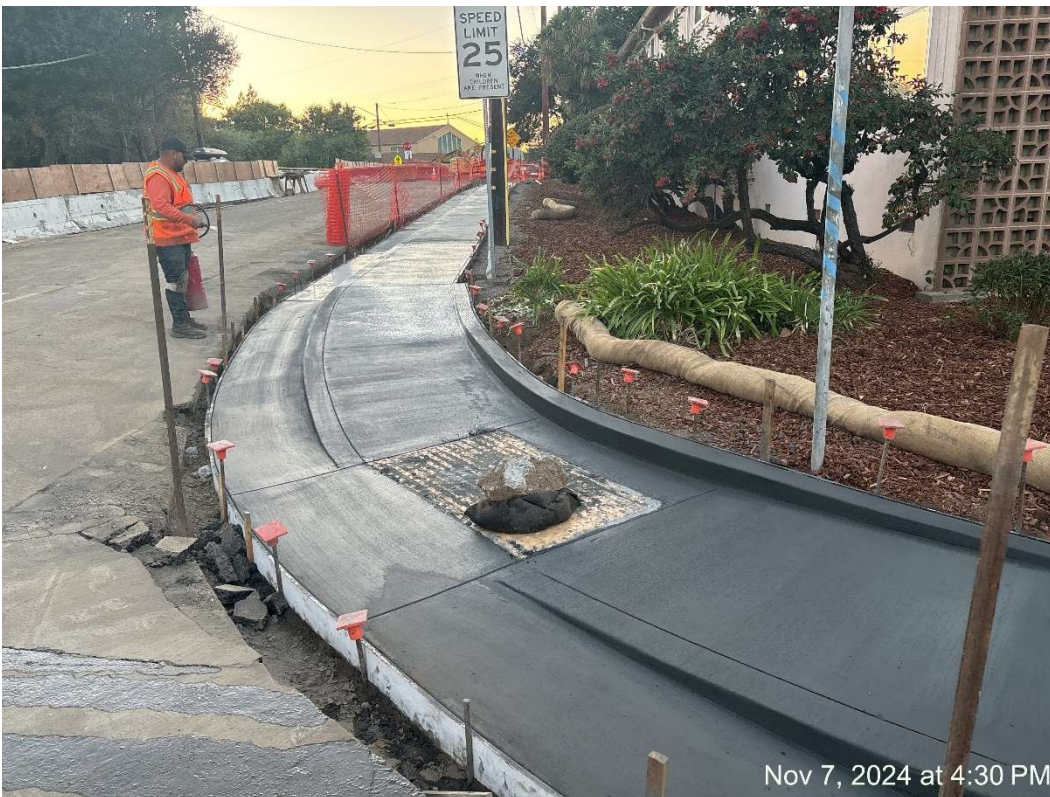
Poured ADA Ramp – NW Corner of Grant Ave & 8th Street.
